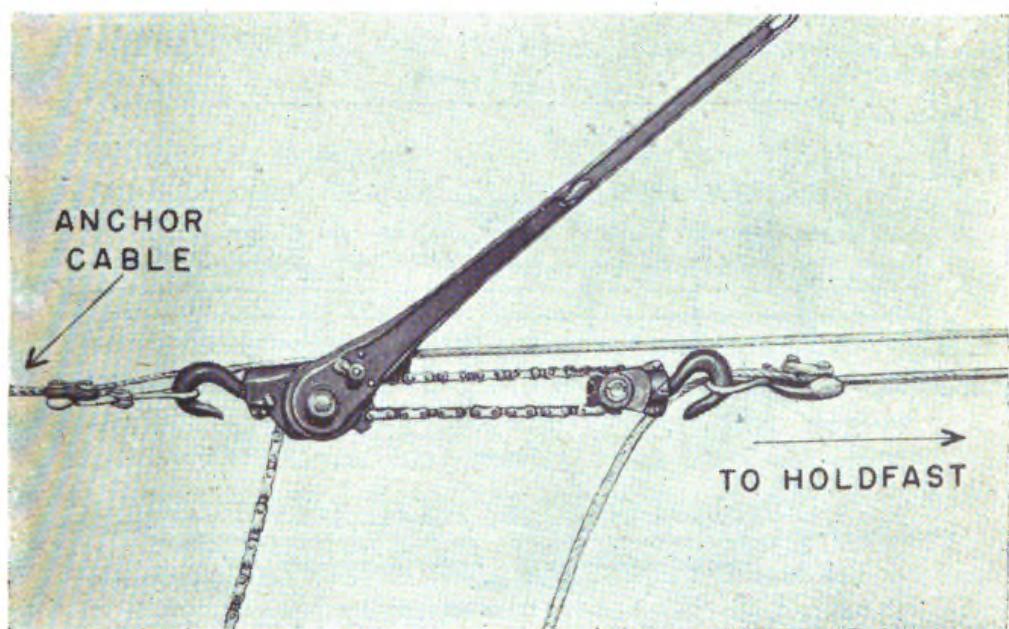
Ratchet chain hoist used with cable grips to adjust anchor-cable tension.
